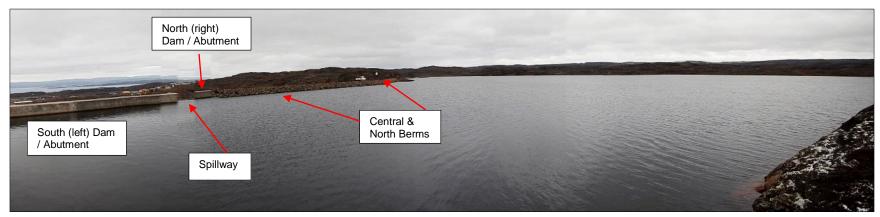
Panorama of reservoir and dam looking northwest upstream of left abutment.
